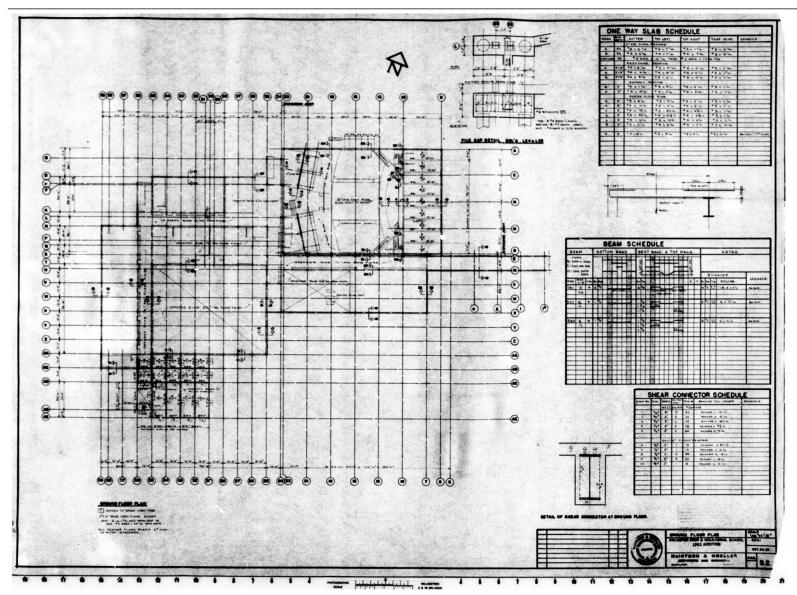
Ancaster High – McIntosh & Moeller, Ground Floor Plan, West Wing Addition (Auditorium) 1967 (Slide 41-137: Provided by Hamilton Wentworth District School Board Archives)
